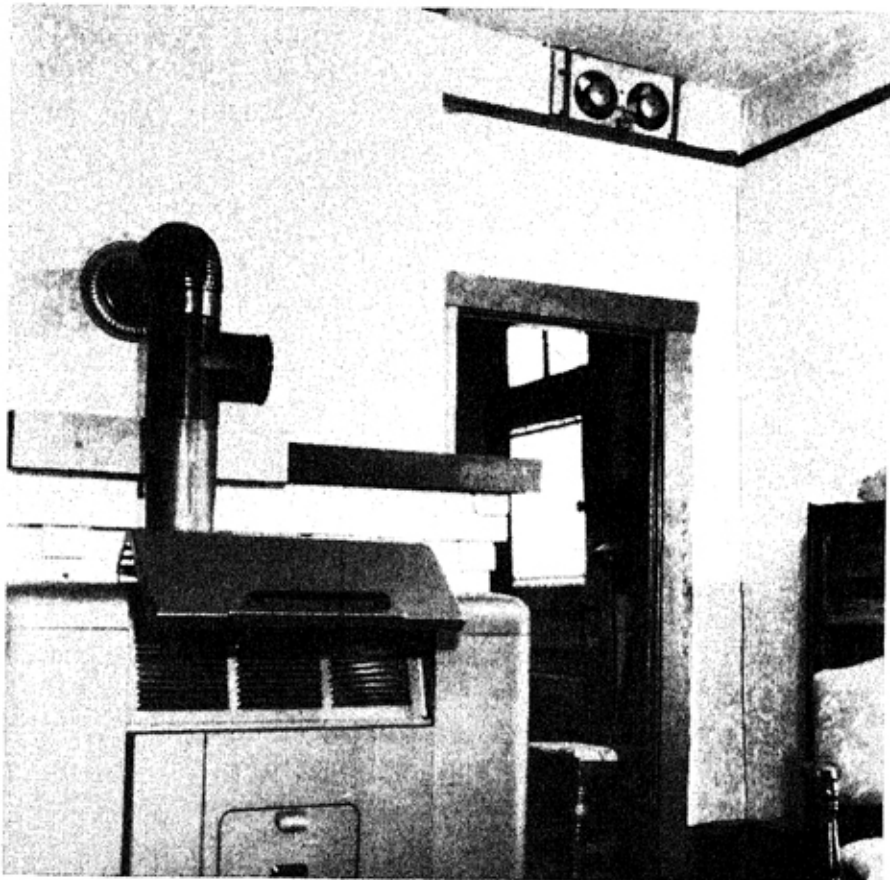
A view of the twin 150 cubic feet per minute wall fans placed in end of duct (upper right hand corner) of House No. 3. The fan thermostat is shown above the twin burner oil-fired circulating heater and to the left of fans.
